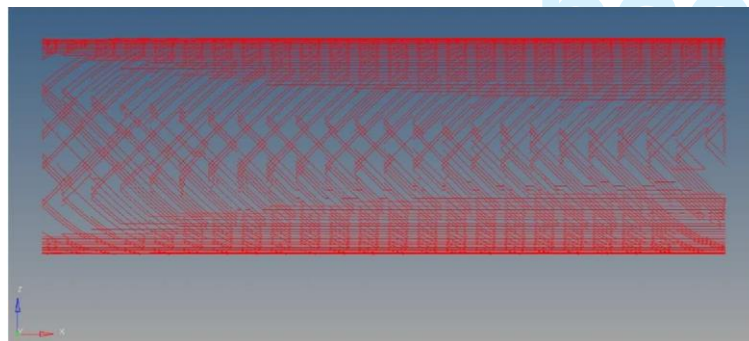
Side view of the optimal reinforcement pattern under multi-load cases with 1D beam element modelling
